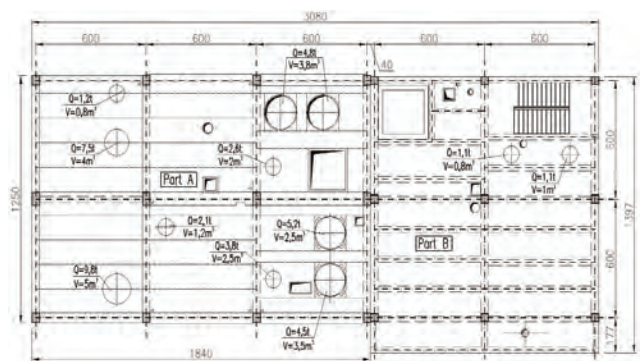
Plan of the flooring system structure at the level of +4.20 (first floor slab)
